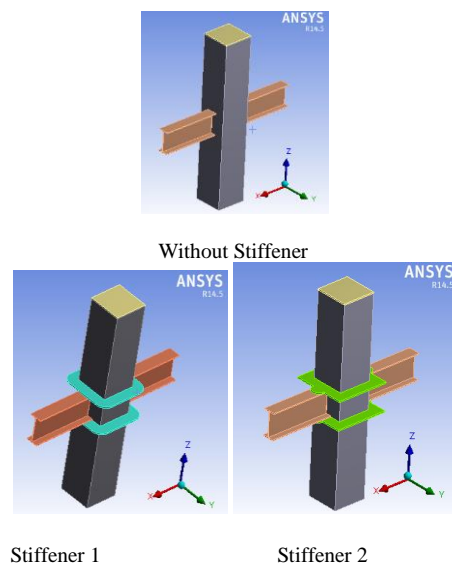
Beam – Rectangular column connections with different Stiffener Configurations
